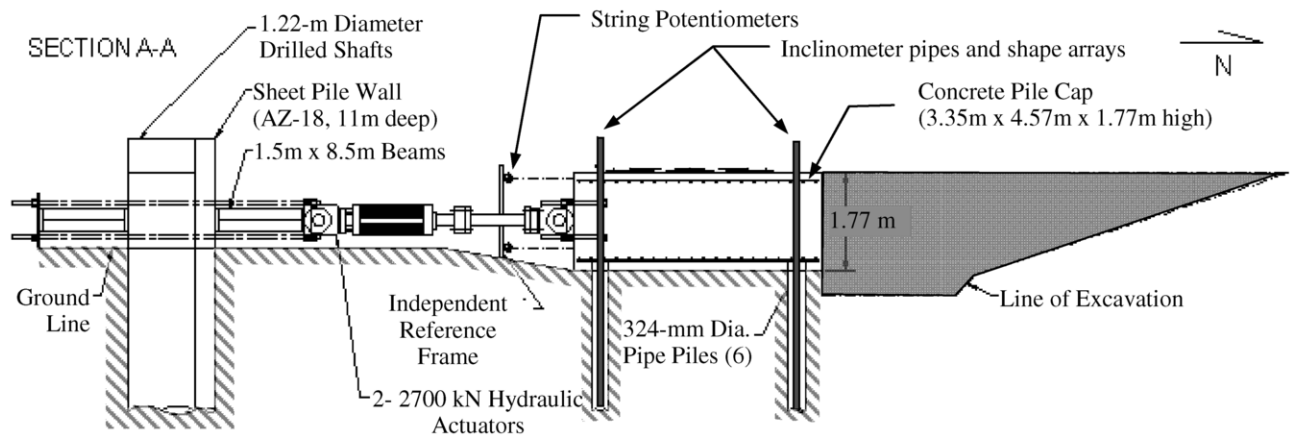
Configuration of pile cap, piles and instrumentation for later load test.
